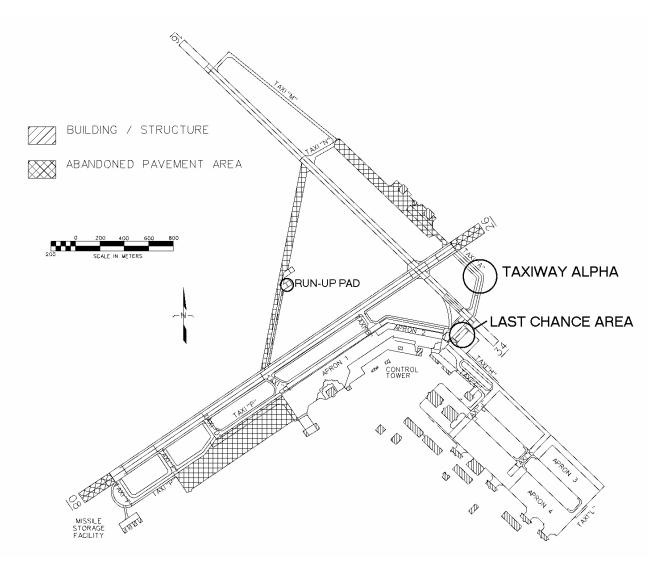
Locations of Rutted Pavement Sections at CFB Goosebay
